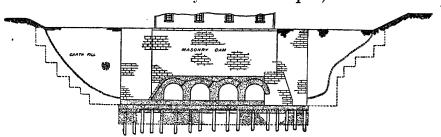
Cross section below masonry dam of Twin Lakes reservoir.
